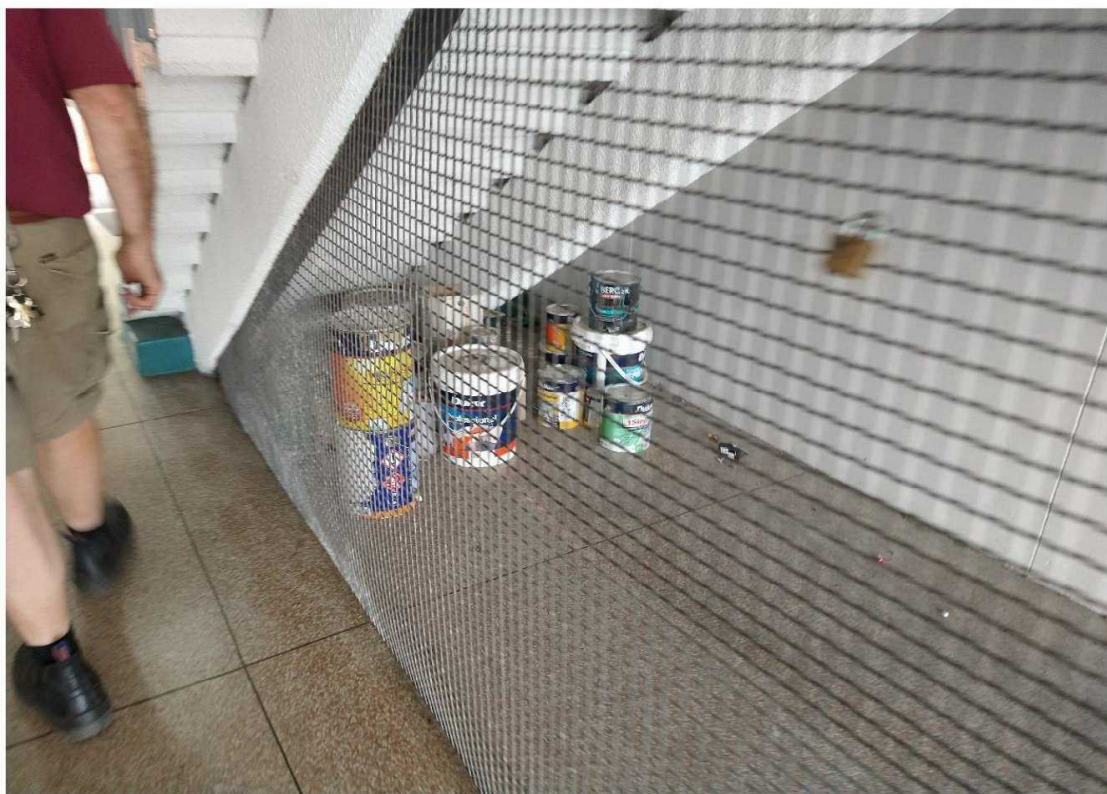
Paints stored beneath the stairs of one of the school buildings in the north of site
